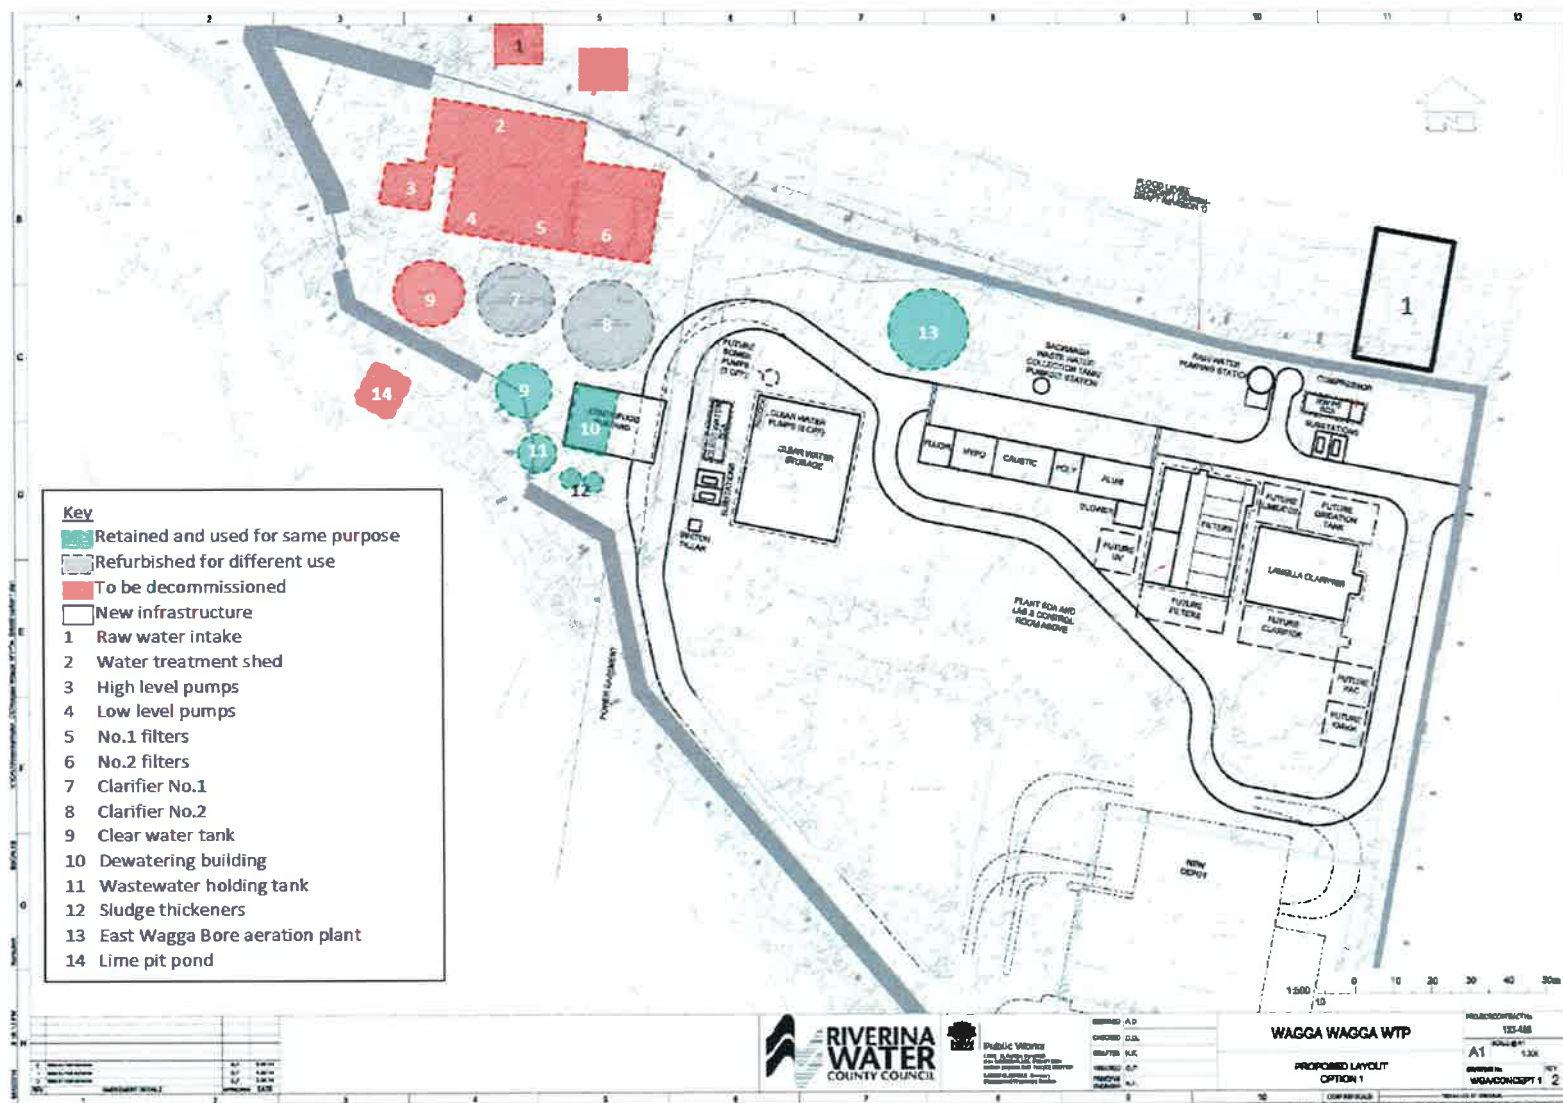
Location of proposed elements to be retained, constructed or decommissioned
